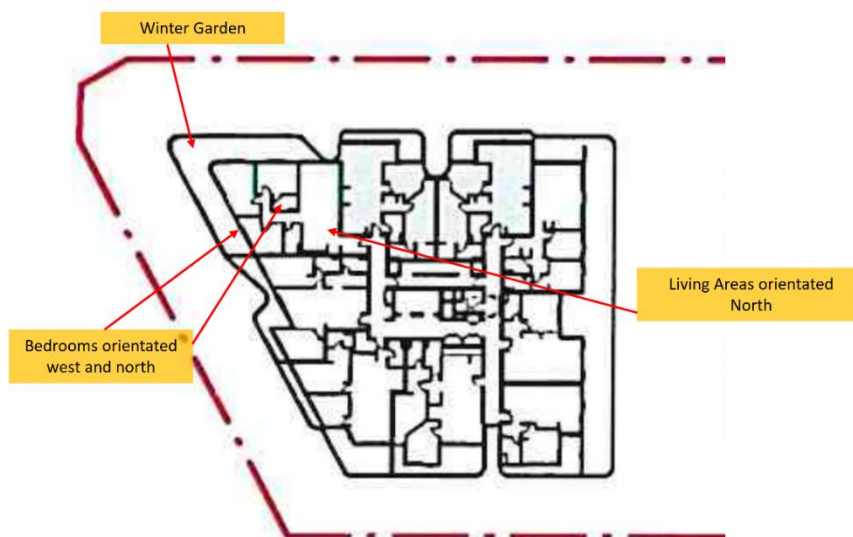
Apartment Layout extract from stamped plans of DA/397/2020 (Source: PTW Architects)
